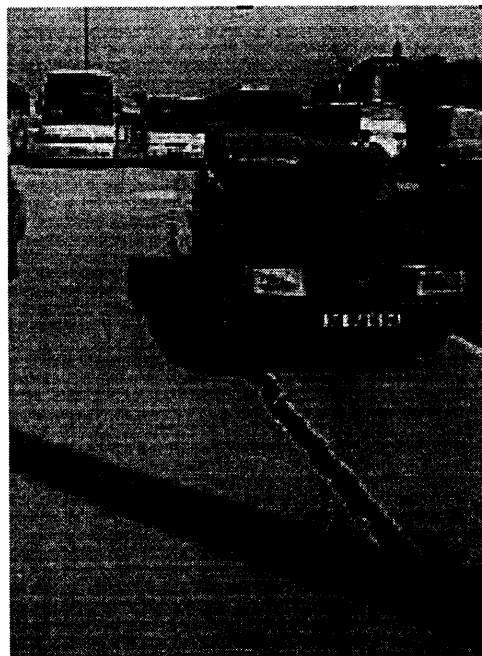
Photograph showing a lateral spread crack that developed in the paved parking area at Yalova Harbor. The cobblestone parking area was also damaged (from <http://peer.berkeley.edu/turkey/adapazari>).
